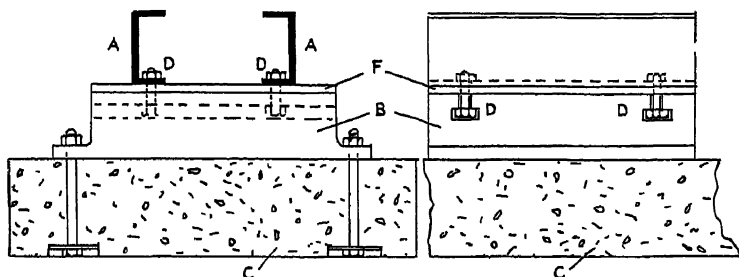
ARRANGEMENT OF CHANNELS AND BASE CASTINGS FOR ENGINE TEST BED
